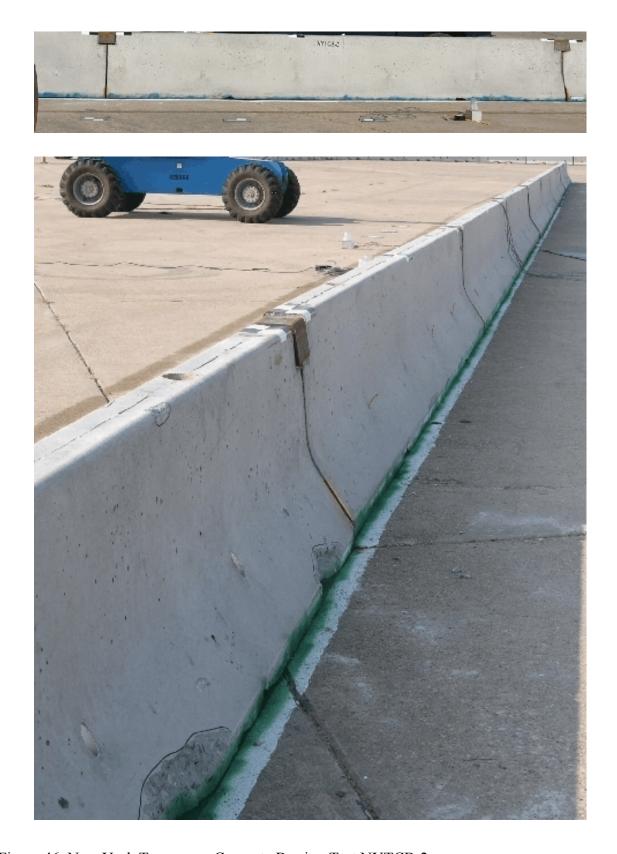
New York Temporary Concrete Barrier, Test NYTCB-2
